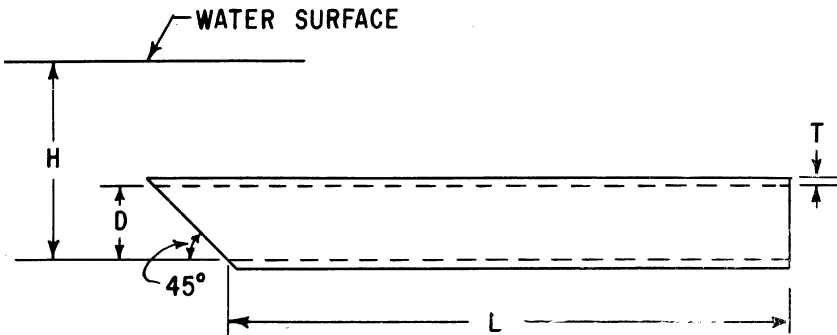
A drawing of the outlet tubes with hooded inlets used in this system.
